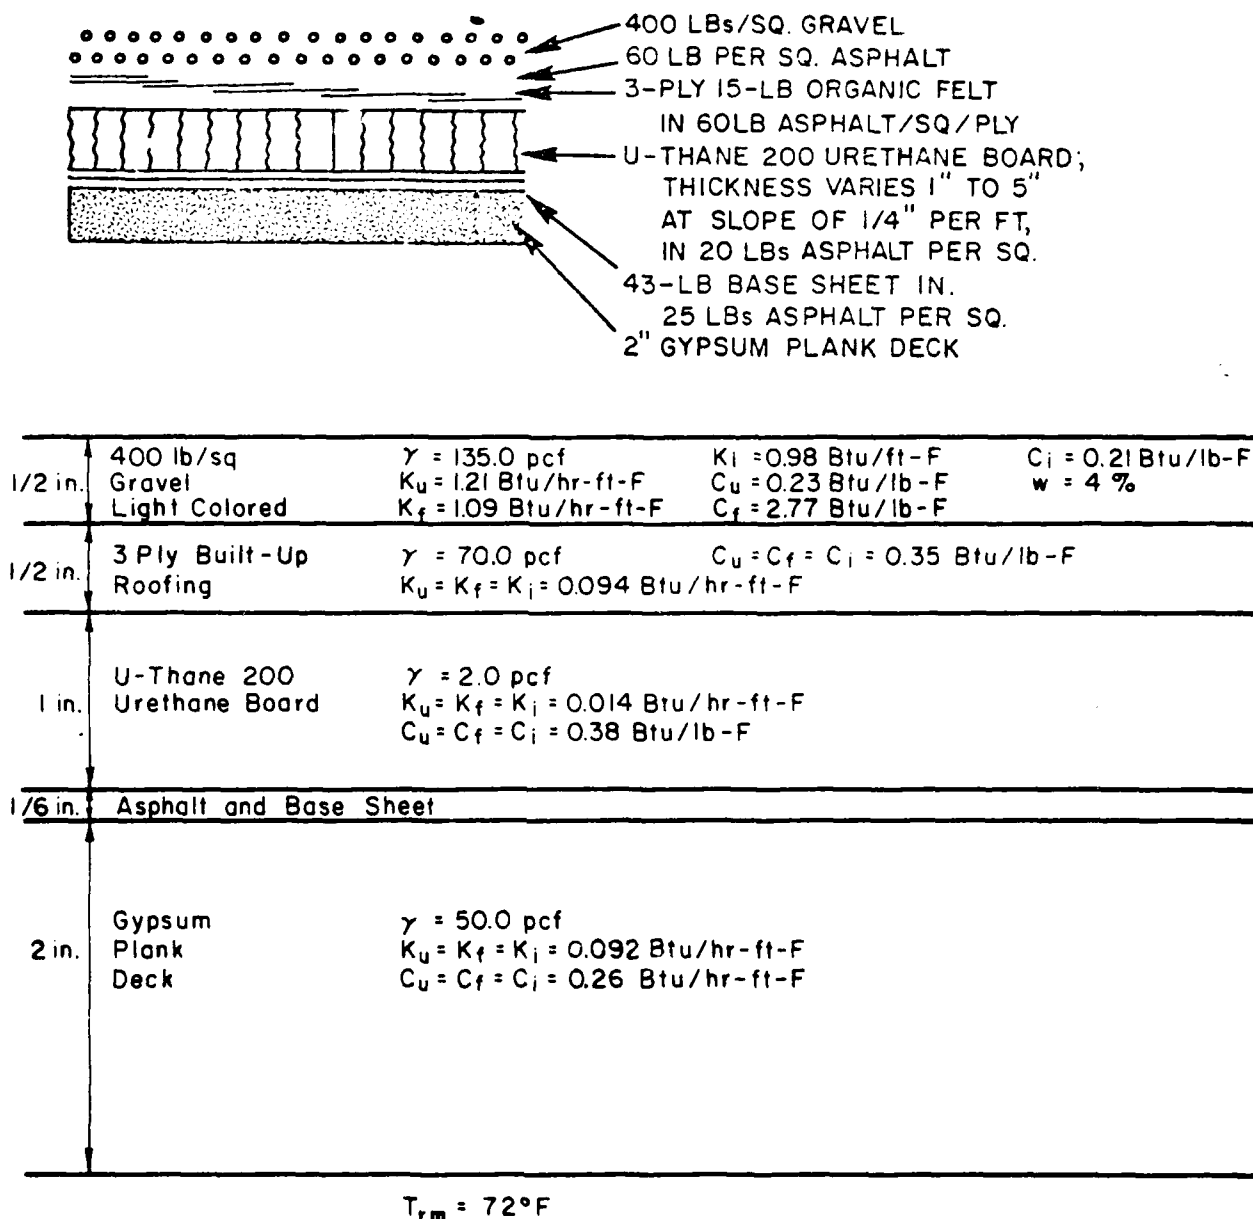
Roof System 3A, Building 3, Cape Hatteras, NC.
